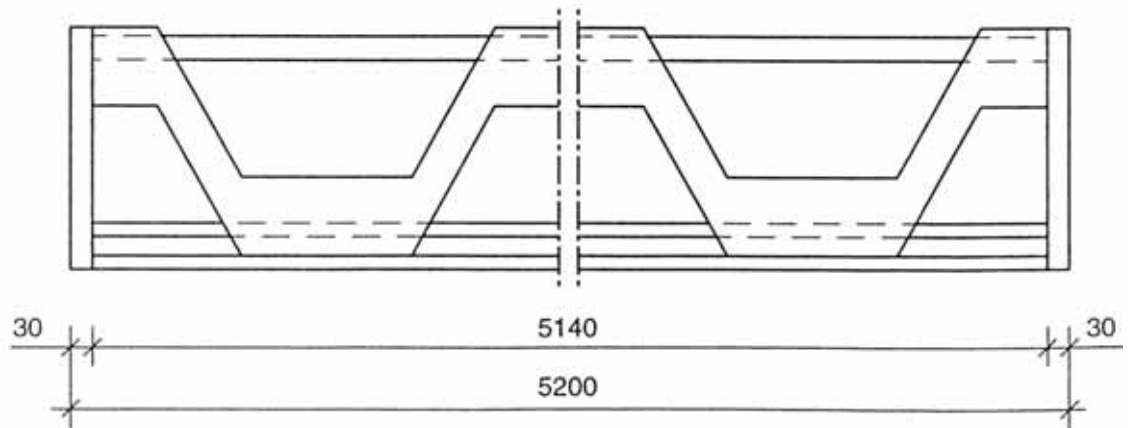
Elevation. Note the zig-zag-shaped connector element.
